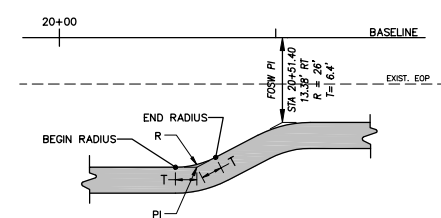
SIDEWALK TAPER AT MANHOLE / UTILITY POLE
